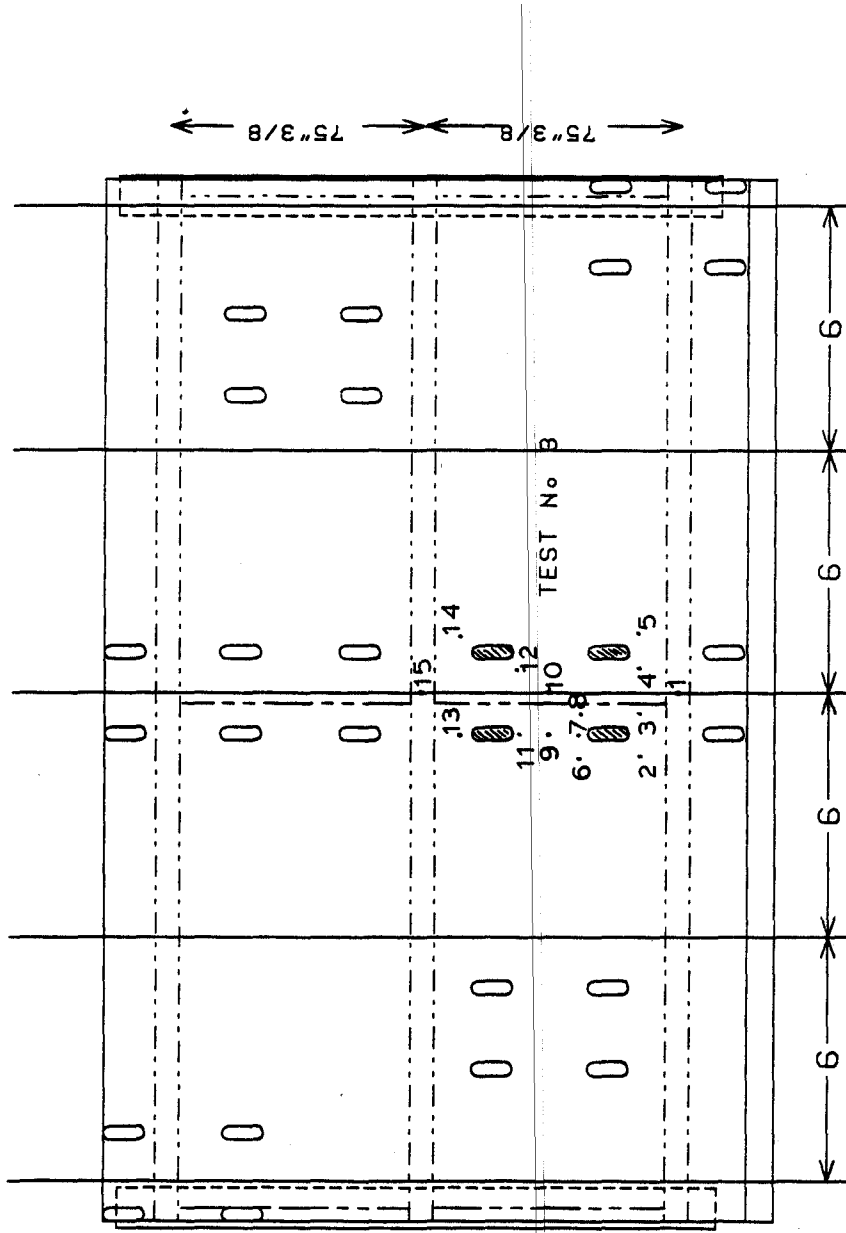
LVDT Locations (Second Bridge - Test No. 3)
